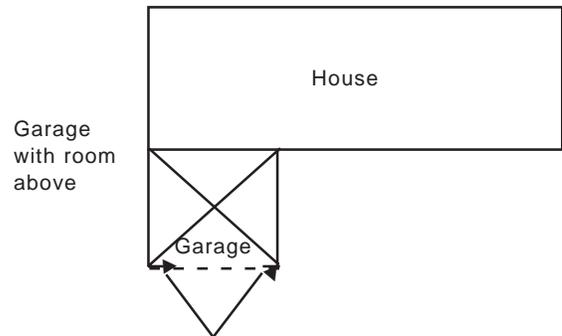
Additional bracing. Home configuration where there is no in-line wall. Additional bracing may be appropriate in this situation.
